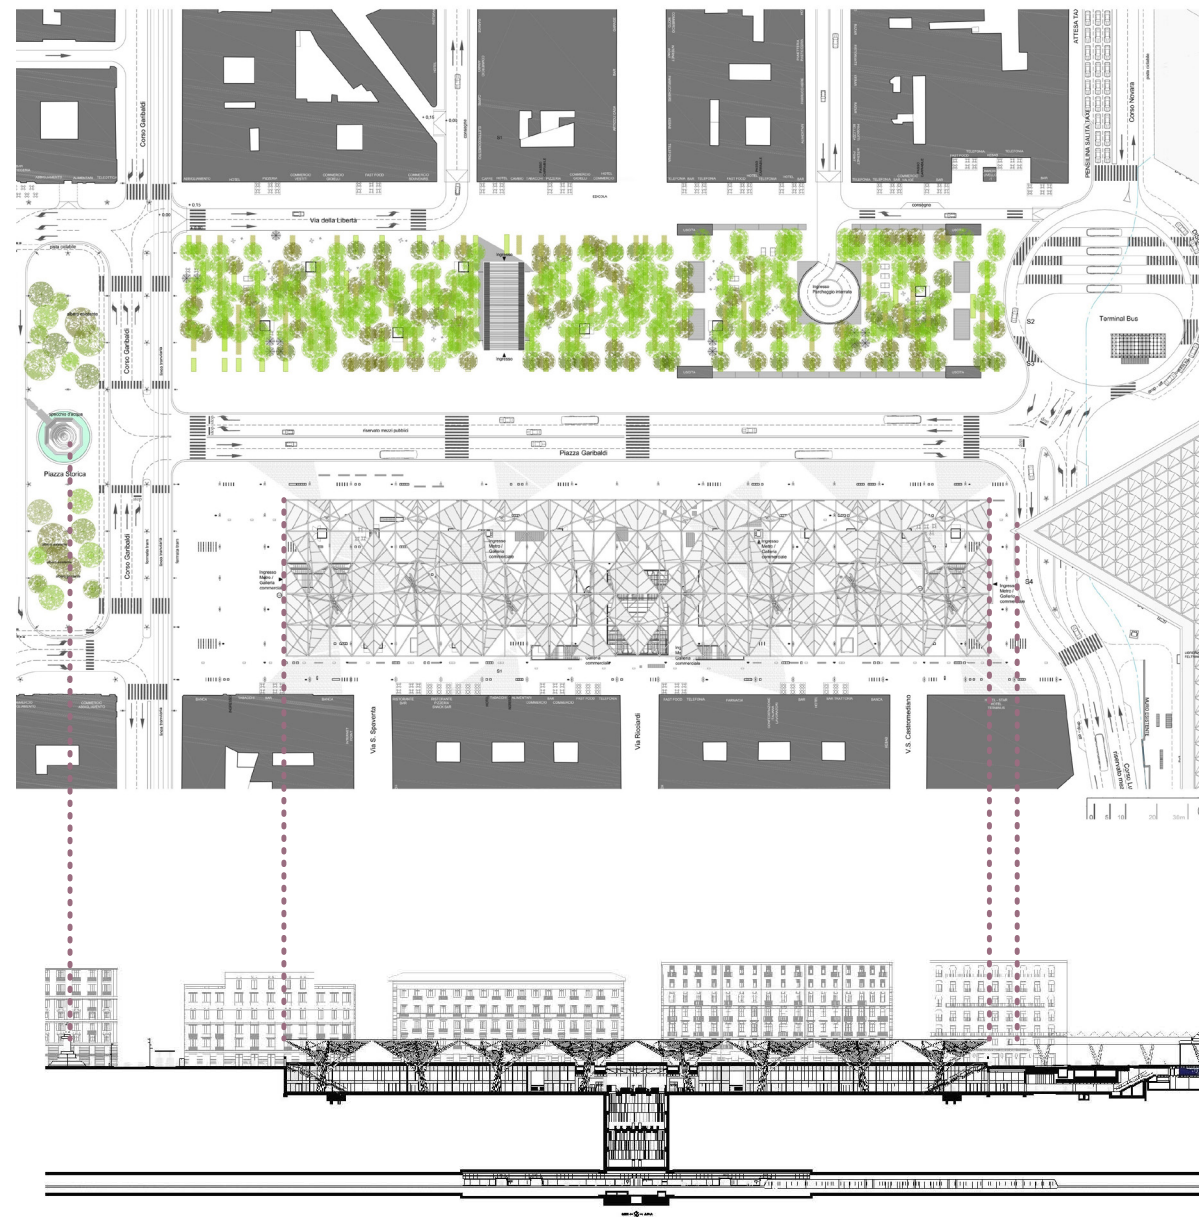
Site plan and section of the piazza. Source: archdaily.com
